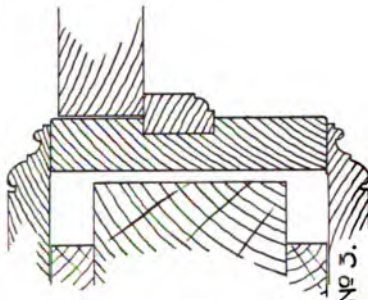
DETAILS OF OUTSIDE DOOR FRAMES, STONE SILL, AND TRANSOMS.
